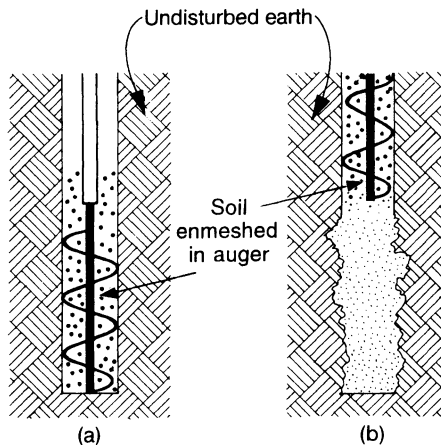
Procedure for installing a pier in sand using a hollow shaft auger.
